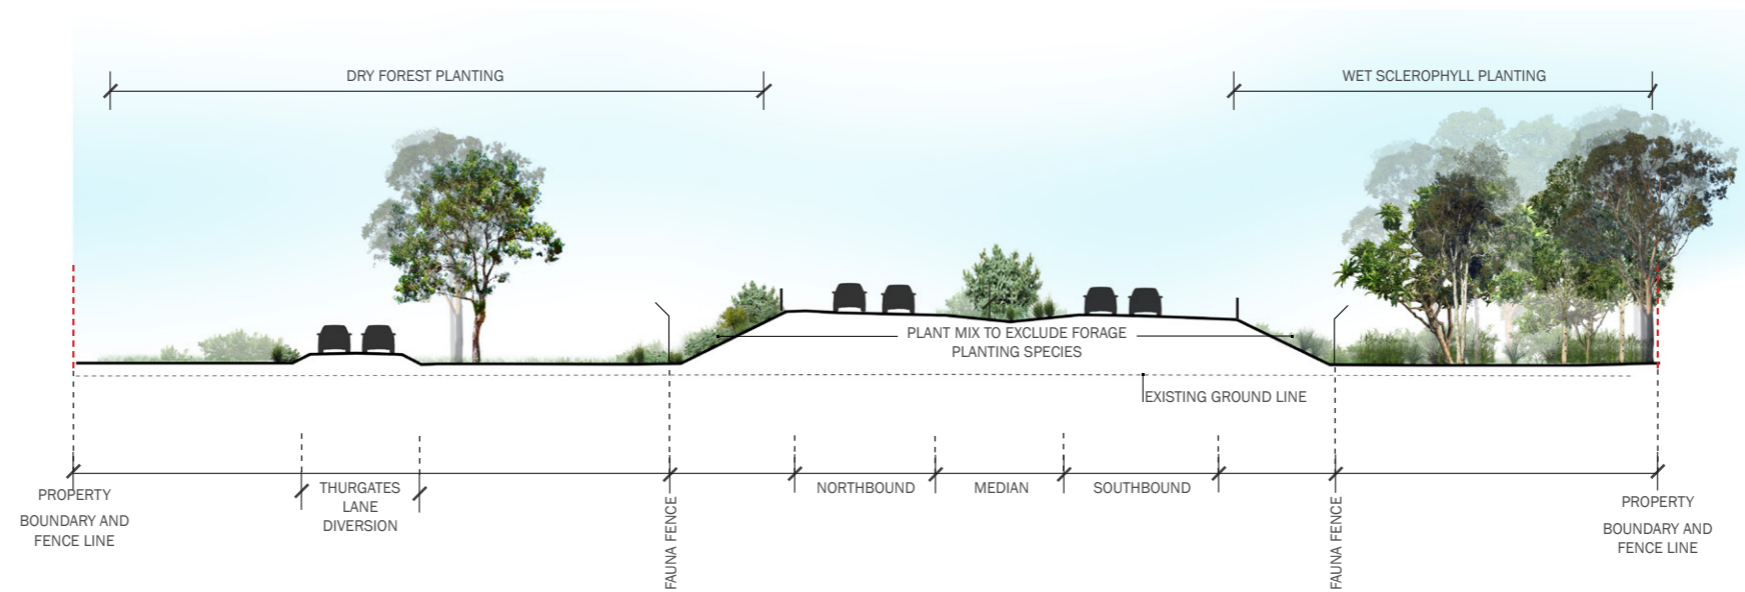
Cross section C-C in Wardell (Scale 1:400) Note: Fence locations and types are to be confirmed, and subject to further design development
